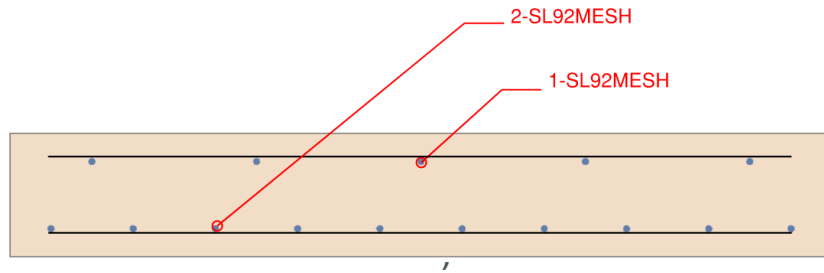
Precast Panel Reinforcement Details (Bottom Part – Critical)
